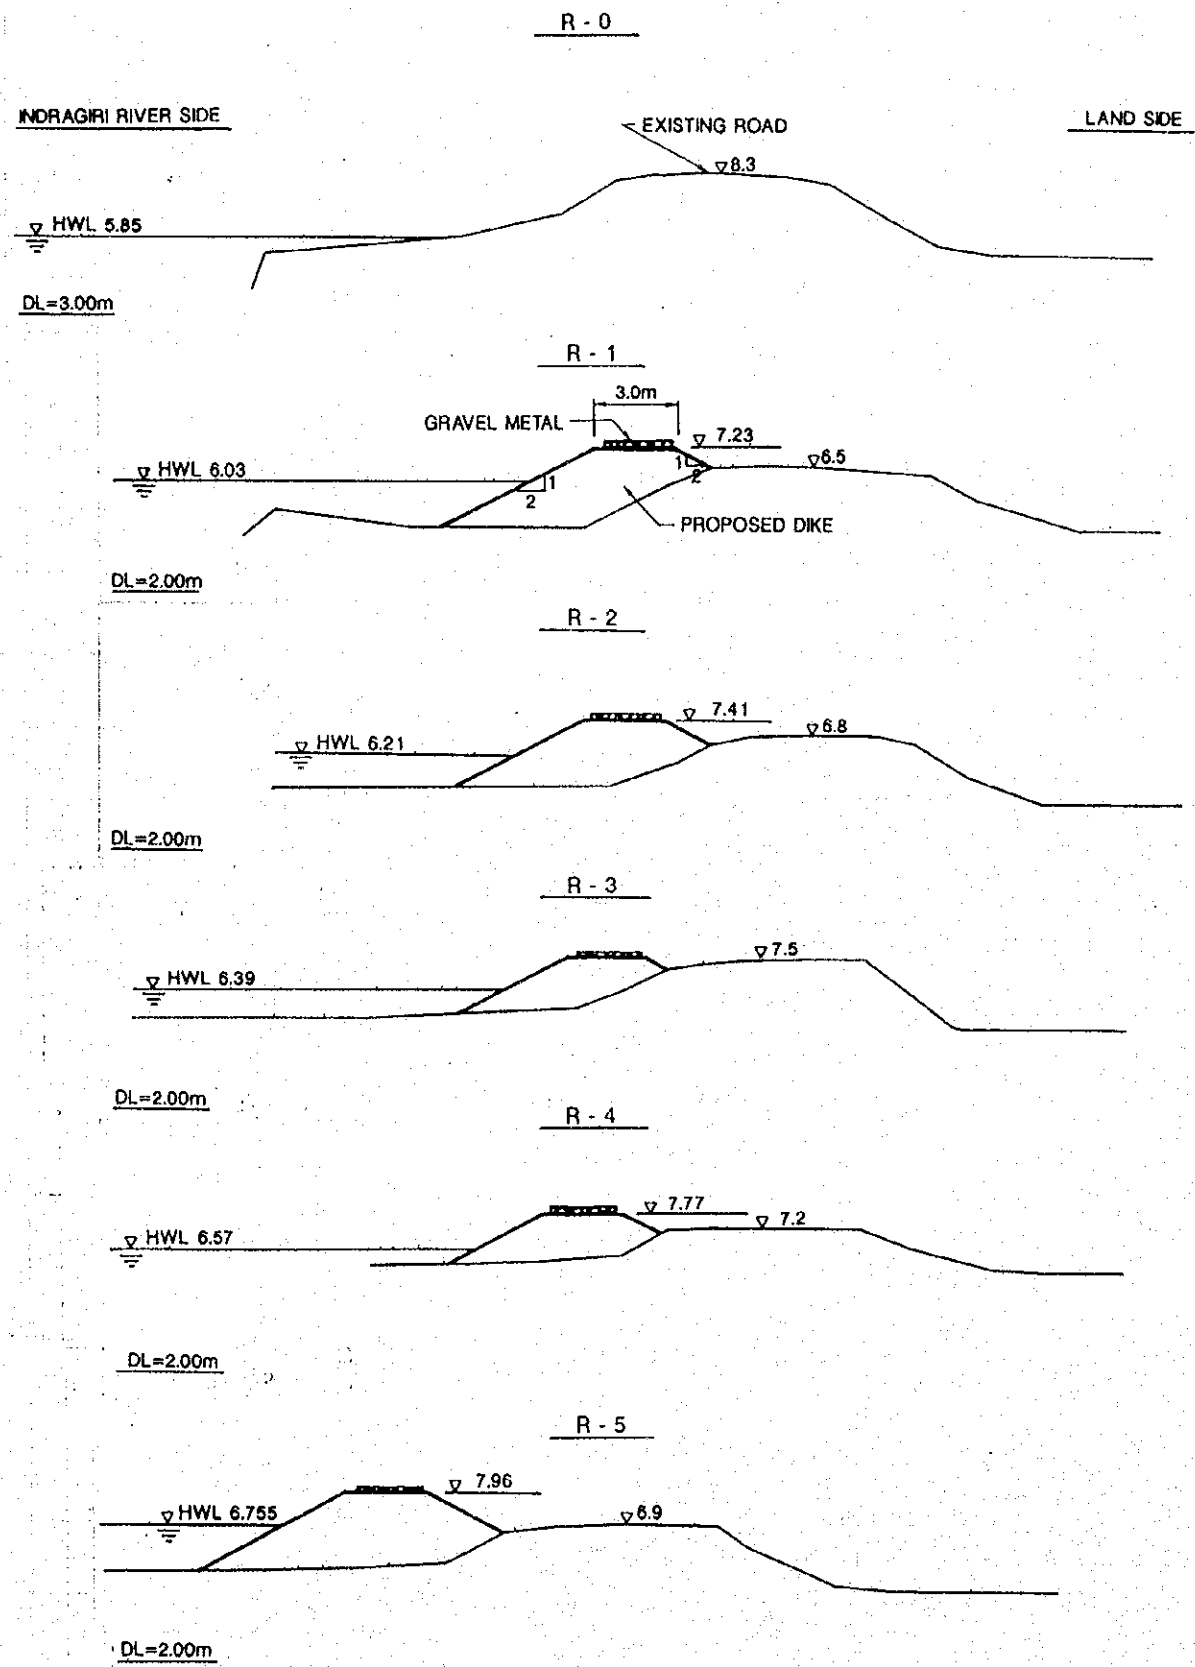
PROPOSED PLAN (INITIAL PLAN) OF FLOOD CONTROL FACILITIES FOR RENGAT AREA
